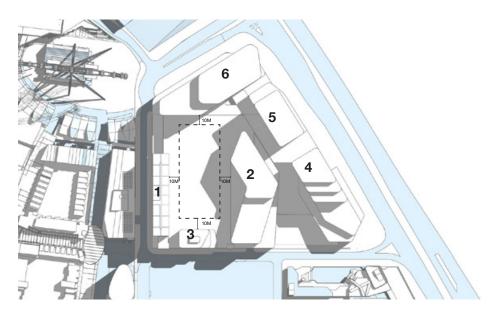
Concept Plan 17 - Shadowing, Elevated Communal Open Space
